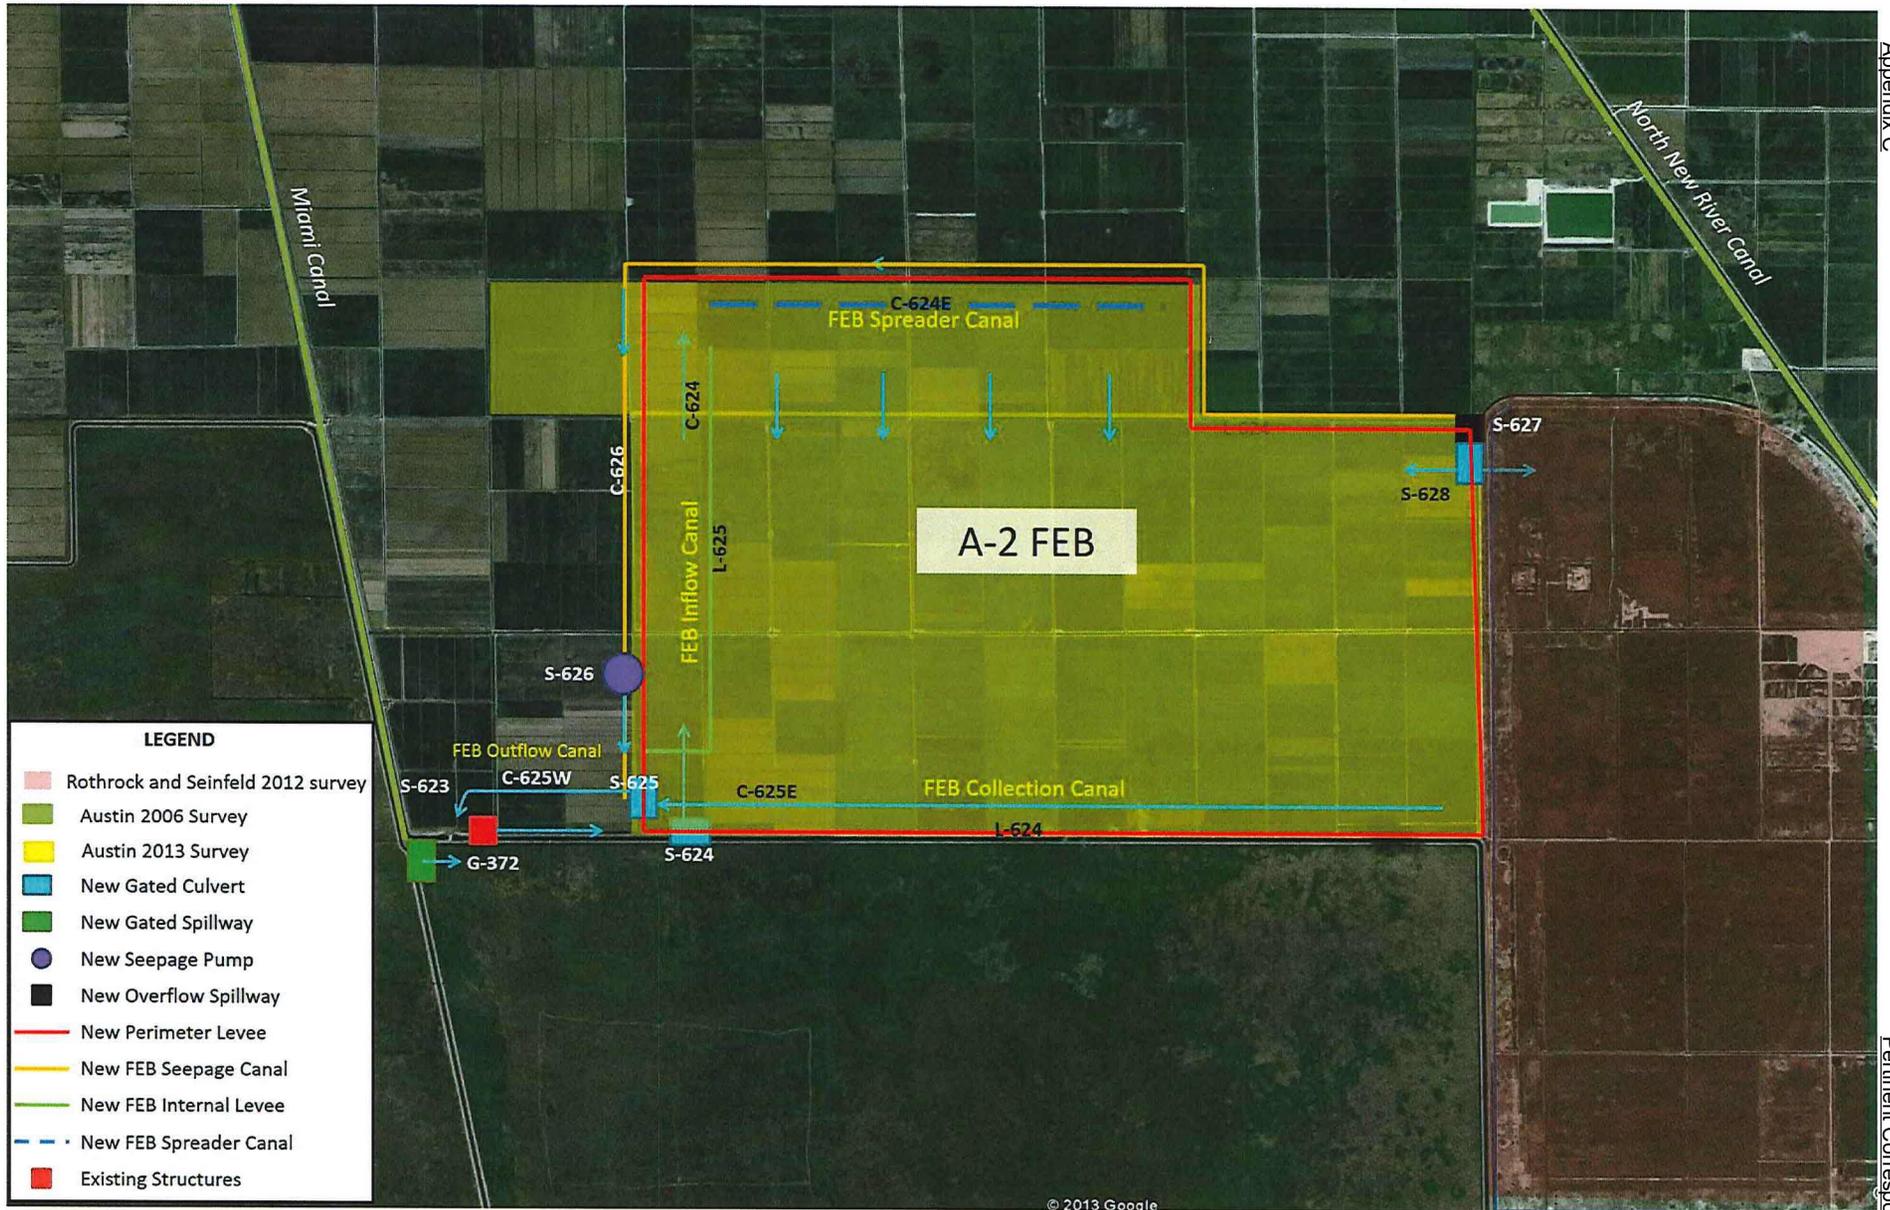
CEPP New Water A-2 FEB as authorized in the 2014 CEPP Recommended Plan.
